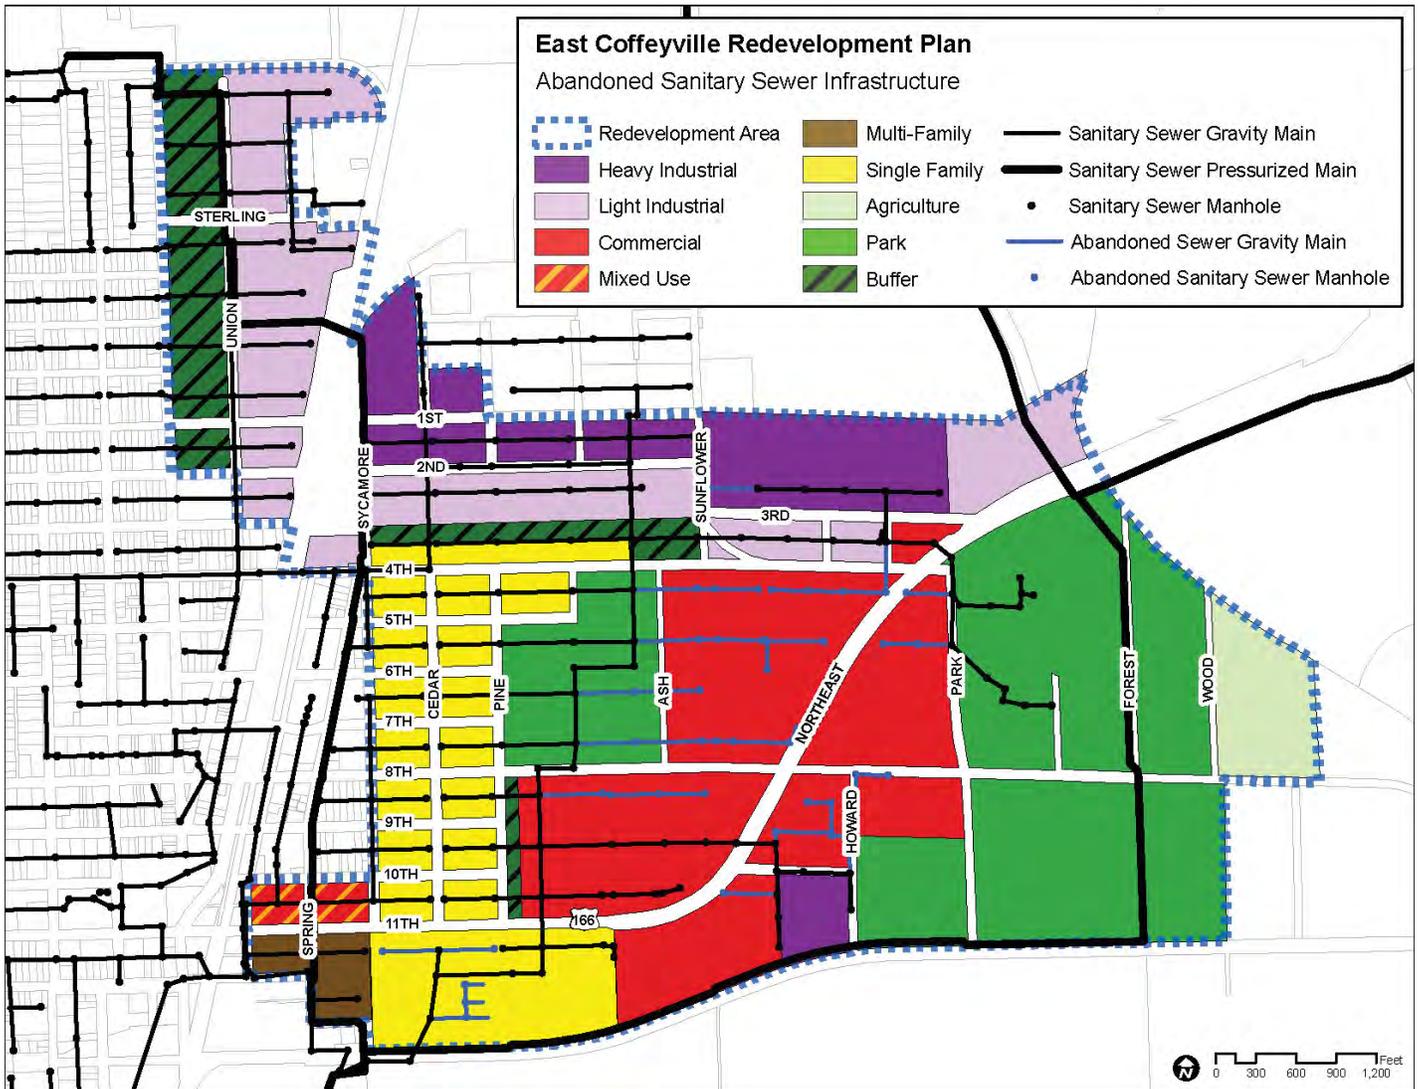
Sanitary Sewer Infrastructure Plan
